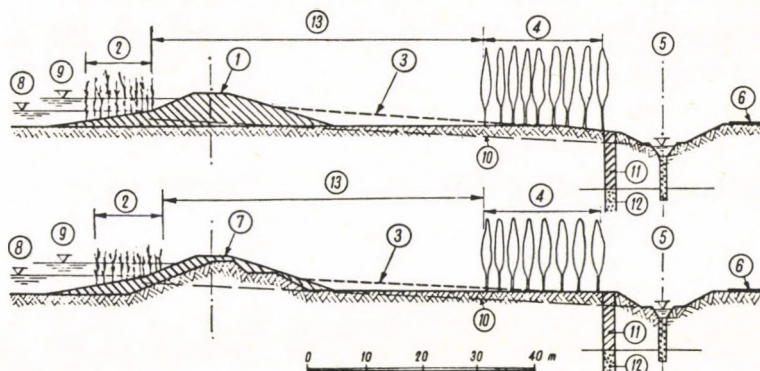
Typical cross-sections through new and reinforced reservoir embankments
